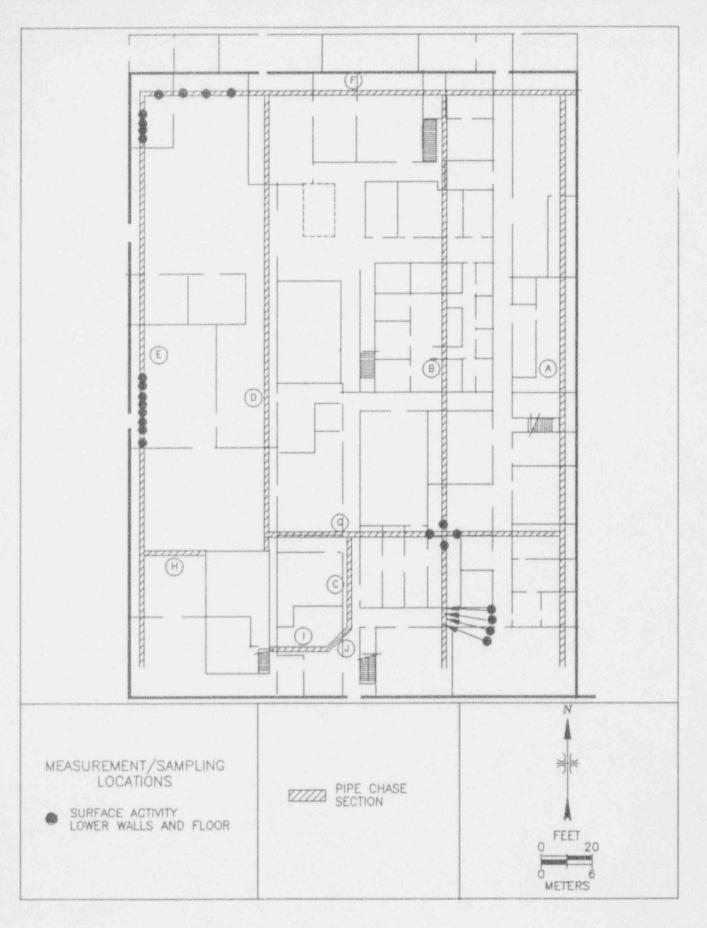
Building 9, First Floor Pipe Chases - Measurement and Sampling Locations
